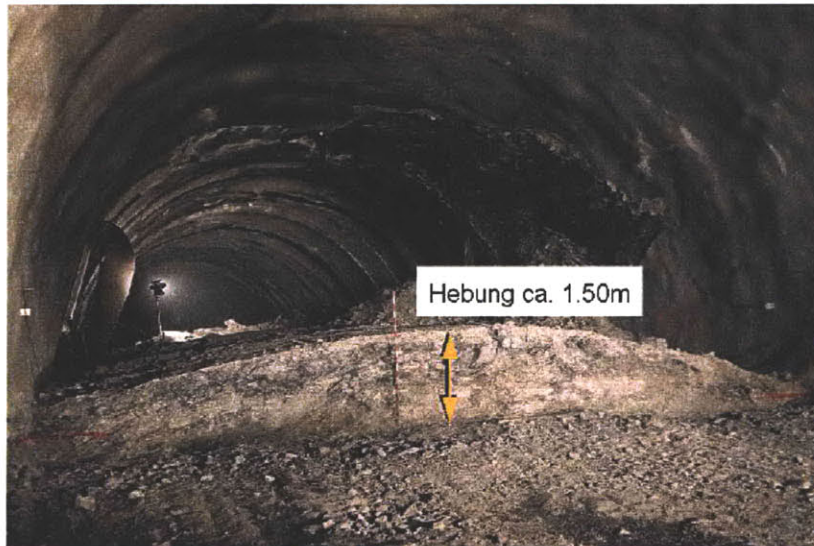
Invert heave at Chienberg tunnel (Chienbergtunnel, N2 Umfahrung Sissach, private correspondence)
